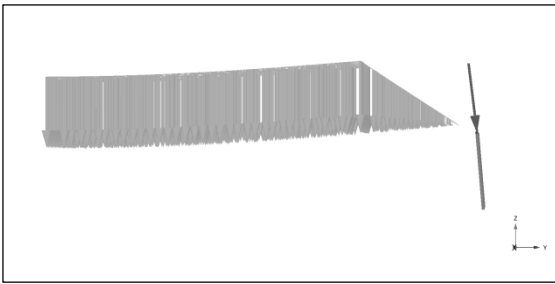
(b) Deformed shape of Shallow Bored Pier (Right side of footing (Scale – 1: 50))
